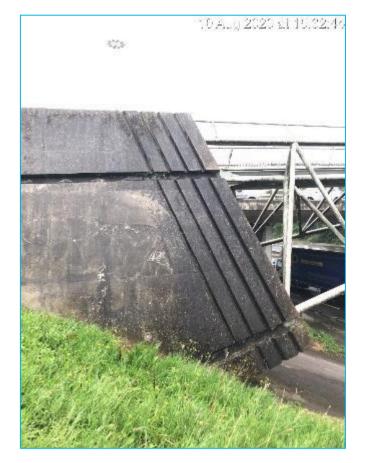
The south abutment of the Existing Ballydowd Footbridge
